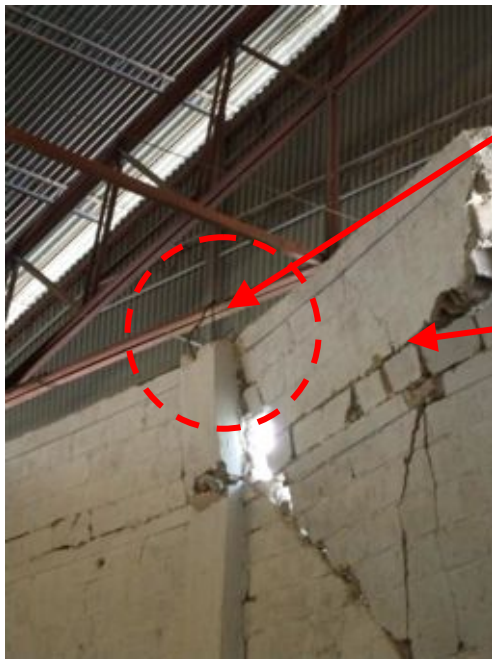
Close up view of nearly collapsed rear warehouse portion. Note how the wall column reinforcement bars have been crudely hooked over the truss bottom chord, nearly pulling the roof down.
